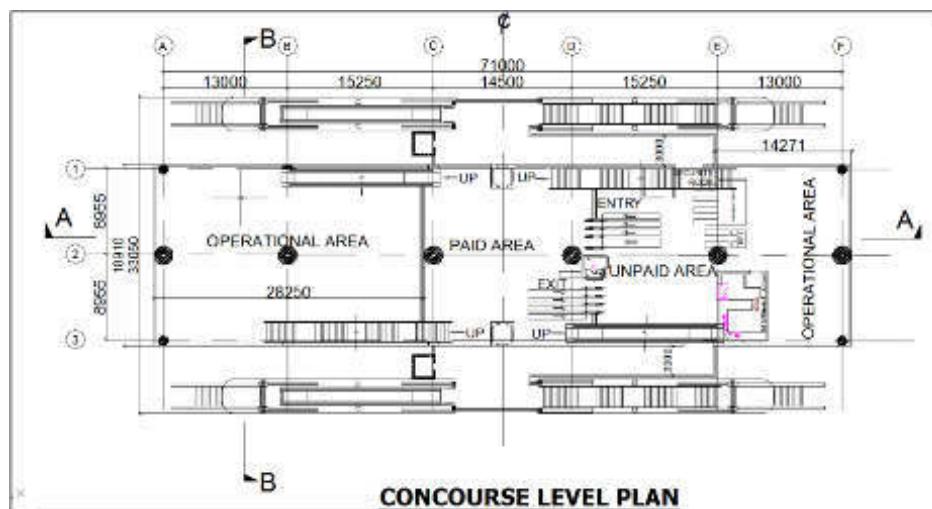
Typical plan of Elevated stations with parallel entry / exits
